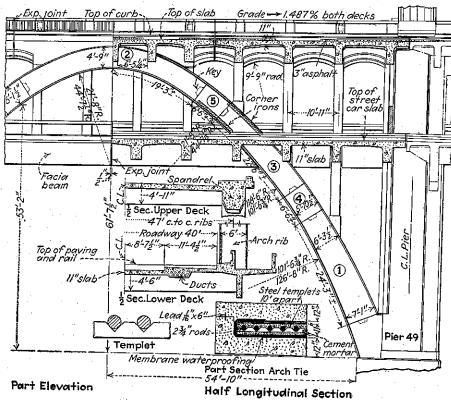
Arch span over Mill Creek. Note double-deck construction.
